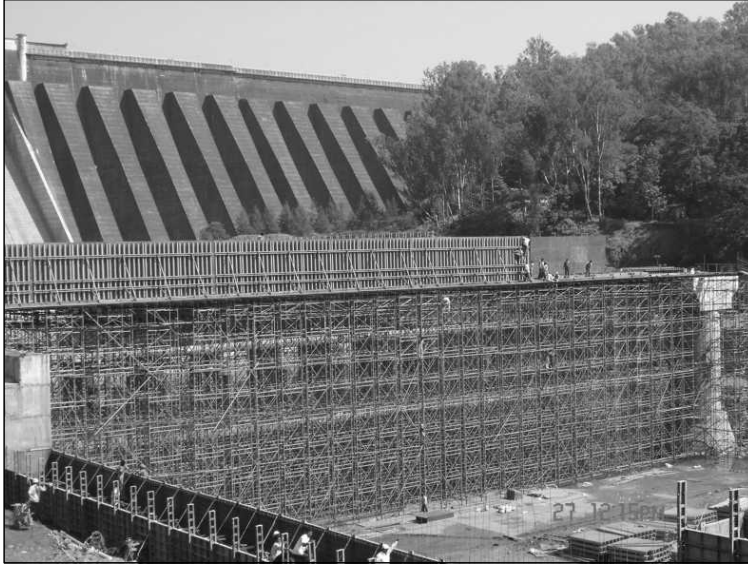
L&T Heavy Duty Tower System in Use for Deck Slab and Girder.
